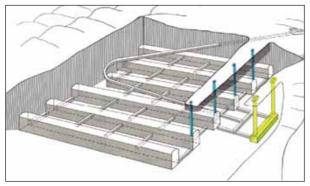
Overview of underground storage caverns and pump room. Pump rooms marked yellow. (Illustration: Norconsult)
